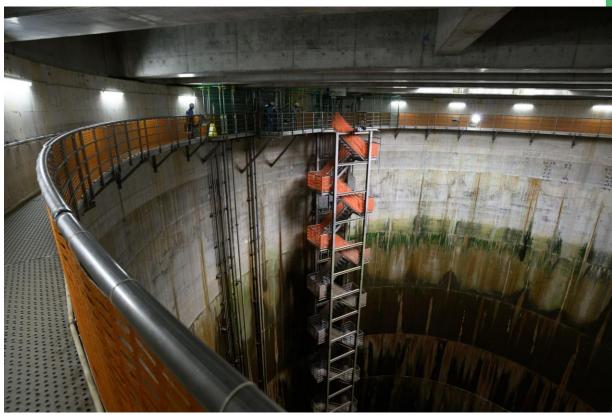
Levees carry the excess water to the five underground cylindrical shafts in Tokyo. Source: Akio Kon, Bloomberg, 2023
